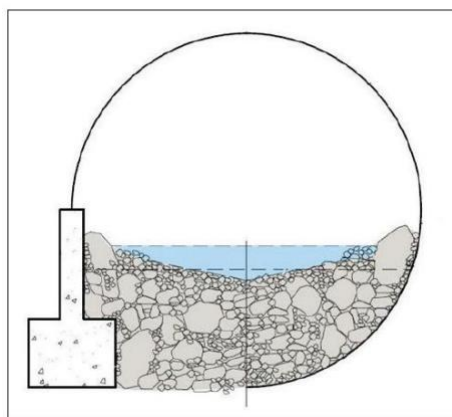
Embedded for open or closed culvert bottom (adapted from USFS, 2008).
